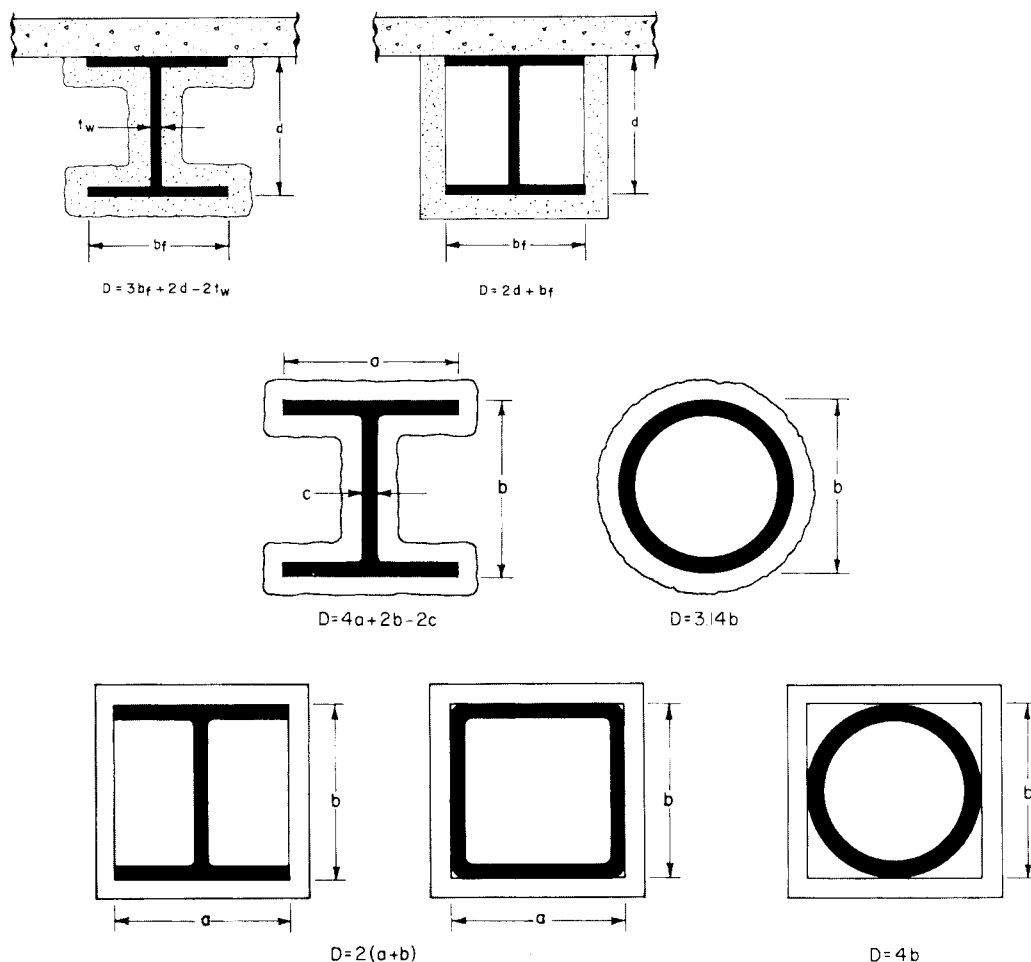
Determination of the heated perimeter of columns and beams. American Iron and Steel Institute; *Designing Fire Protection for Steel Columns, Designing Fire Protection for Steel Beams
